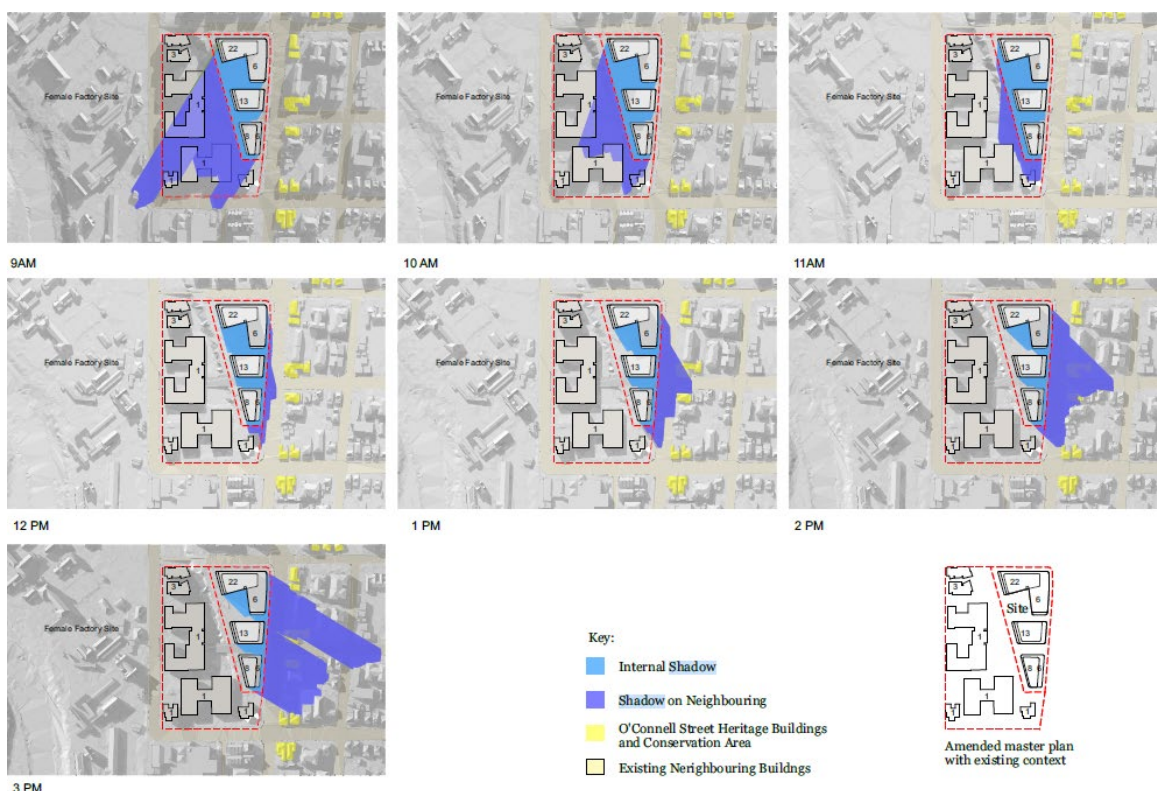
Shadow impacts on existing developments (Source: Urban Design Report)
